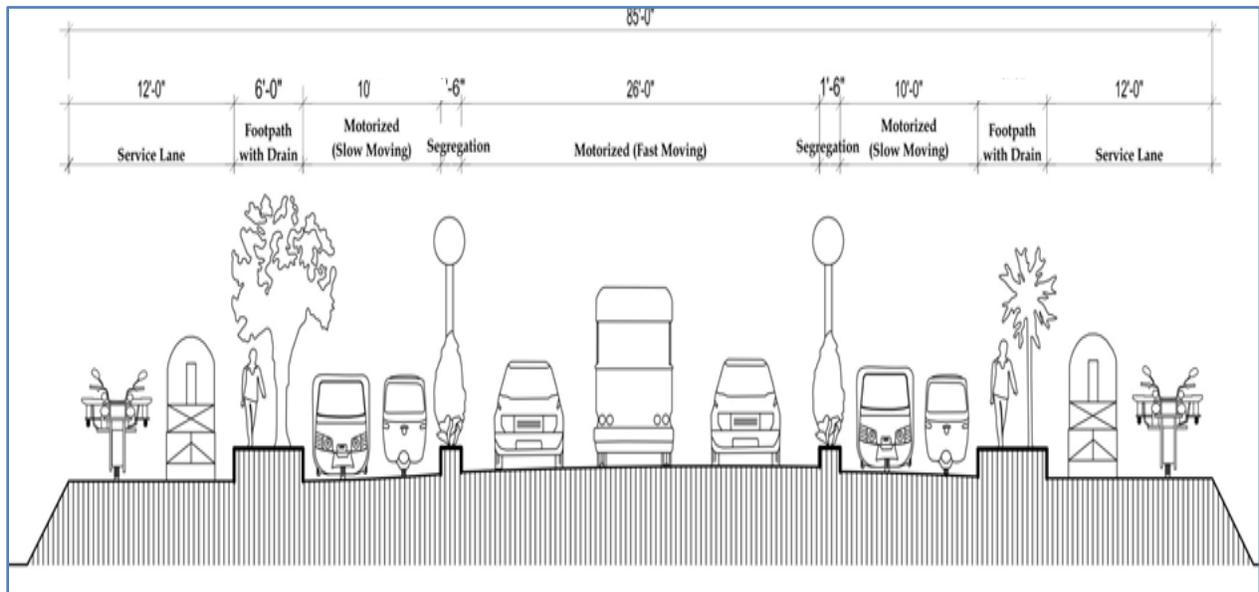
Proposed cross-section of Barisal Bhandaria Pirojpur High way
